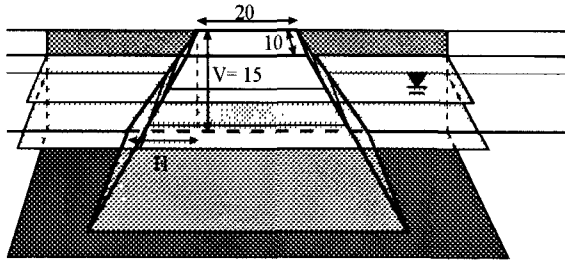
Dimensions of sloped-wall abutments (unit: cm).
